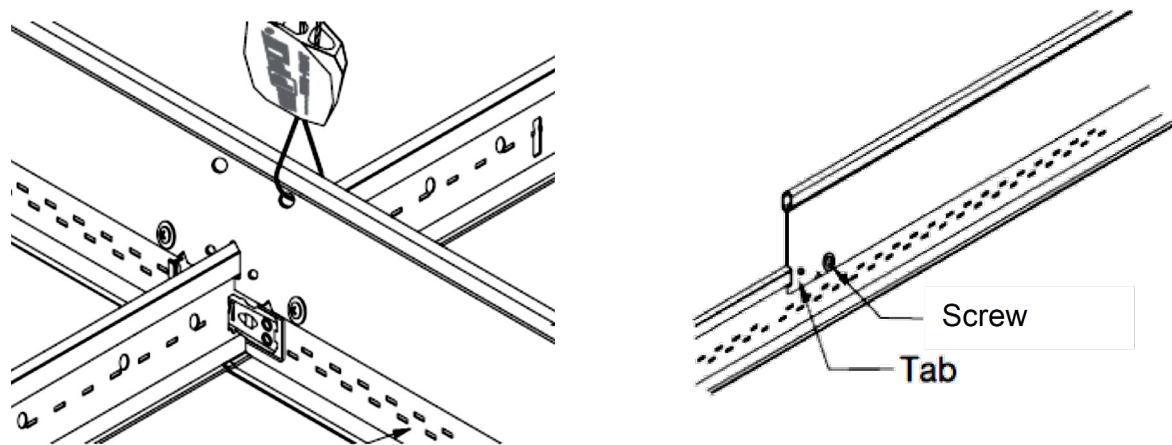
Strong back Connection to Figure 20 – Setting Cross Tee Elevation
